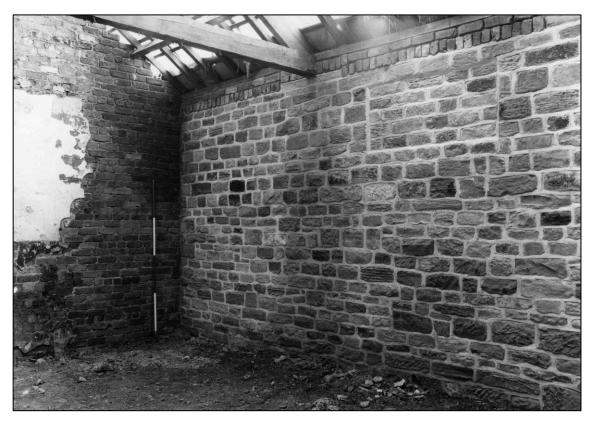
North end of east wall of south room, looking NE (photo 1/5).
